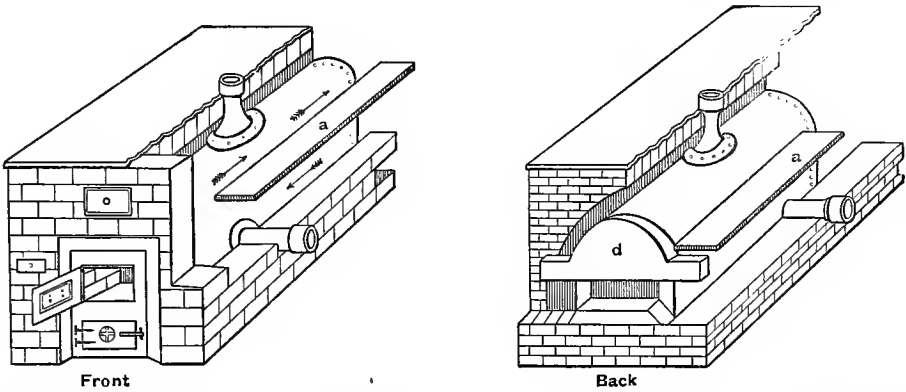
Mode of Setting Plain Saddle Boiler.
